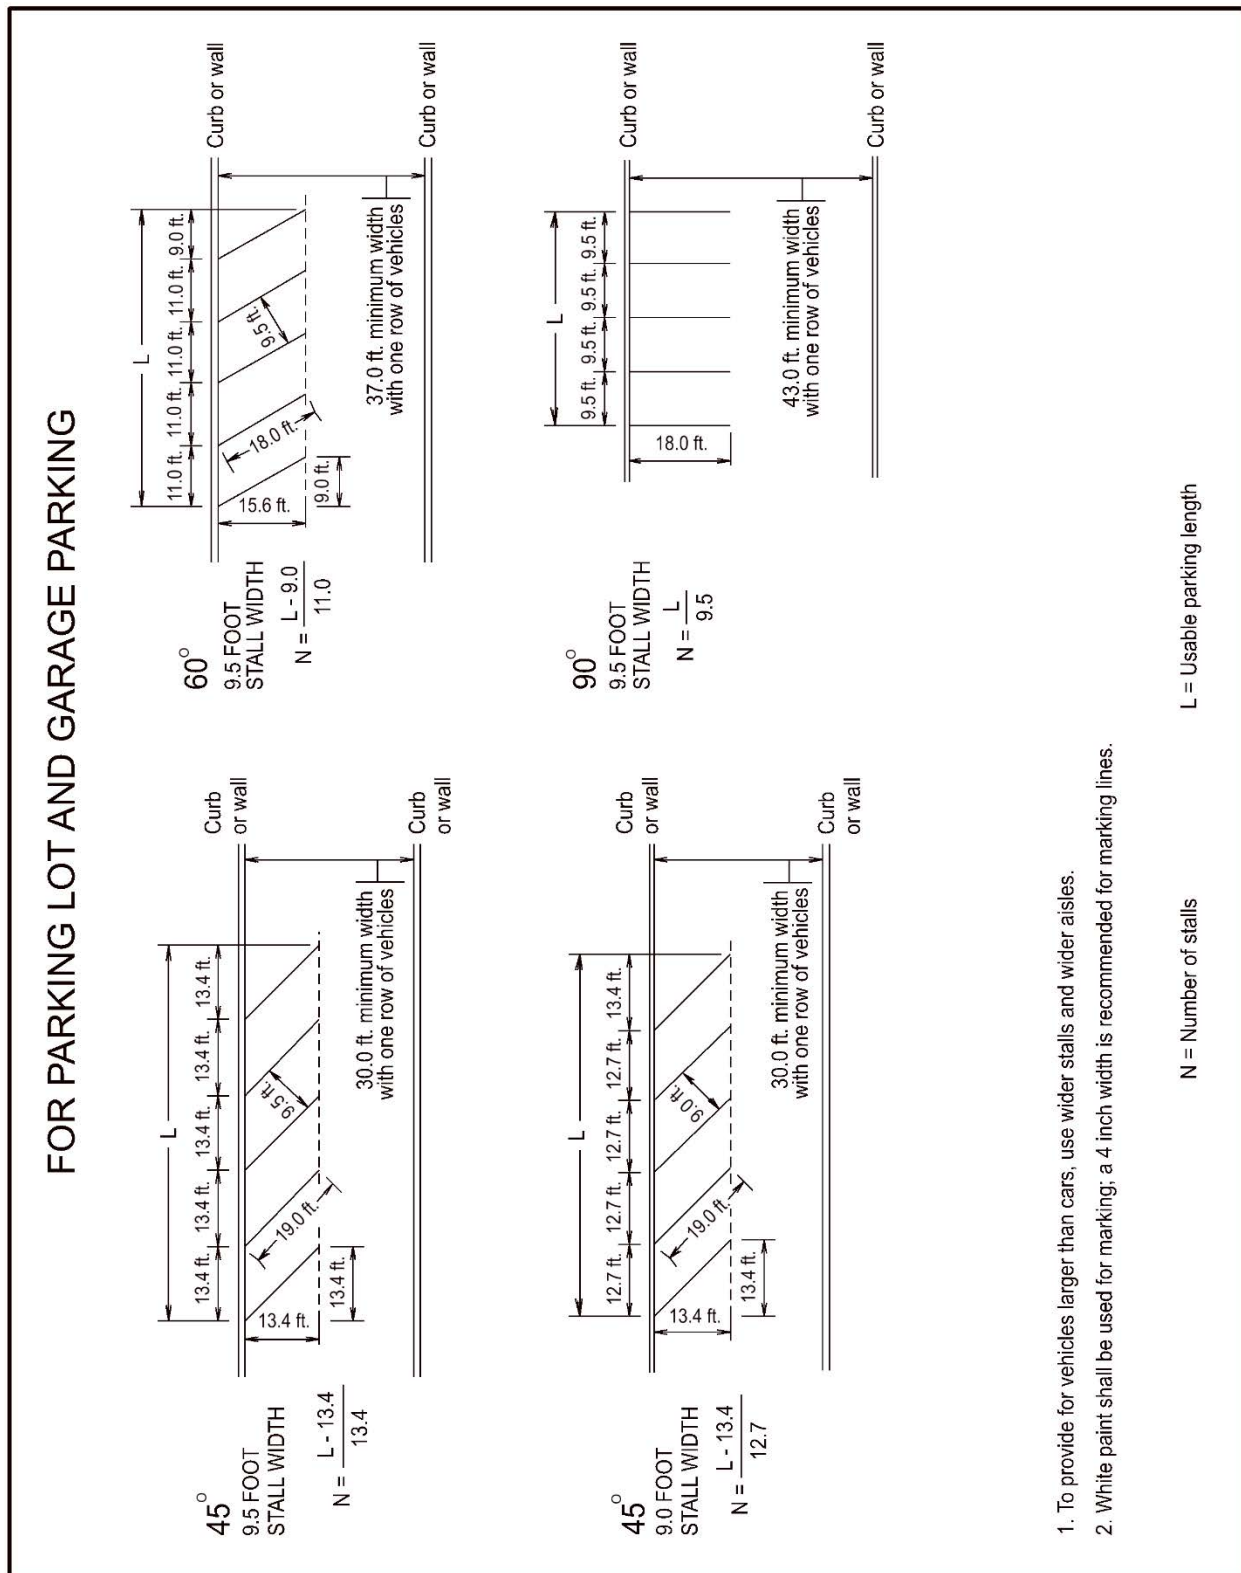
Parking Stall Dimensions for Parking Lots and Garages
